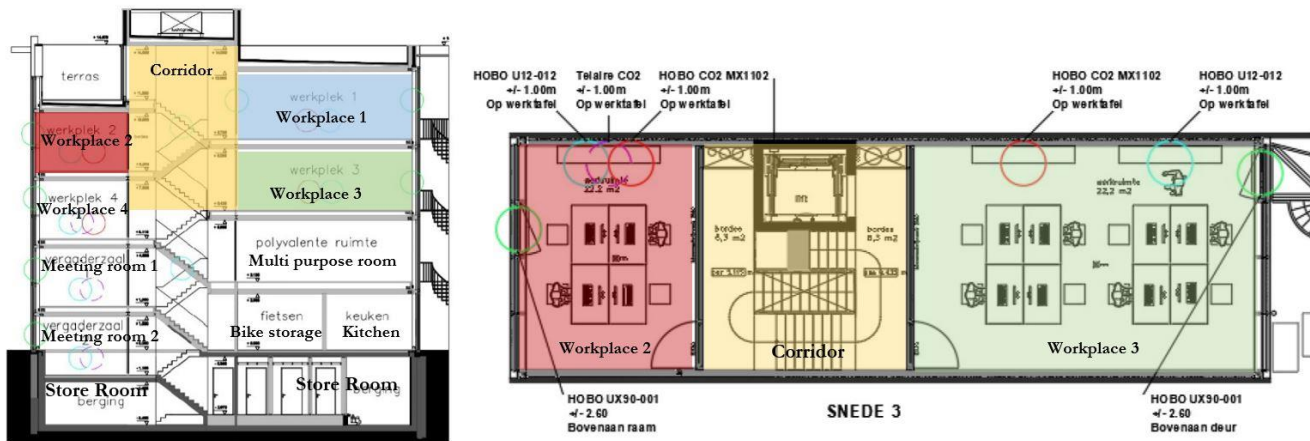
Section (left) and floor plan with sensors(right) of the case study building
